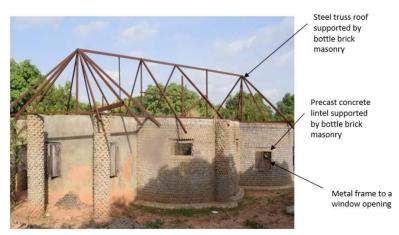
Plastic bottle bricks wall with steel truss roof and metal window frame (Edike et al., 2022)
